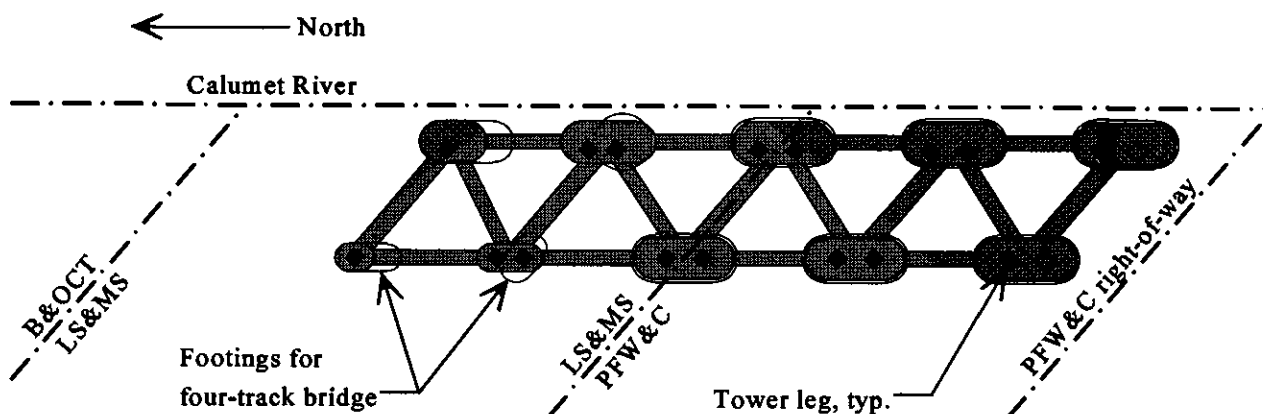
Plan of substructure for PFW&C and LS&MS bridges on west shore of Calumet River (not to scale), showing foundations for alternate scheme. Sketch by author.
